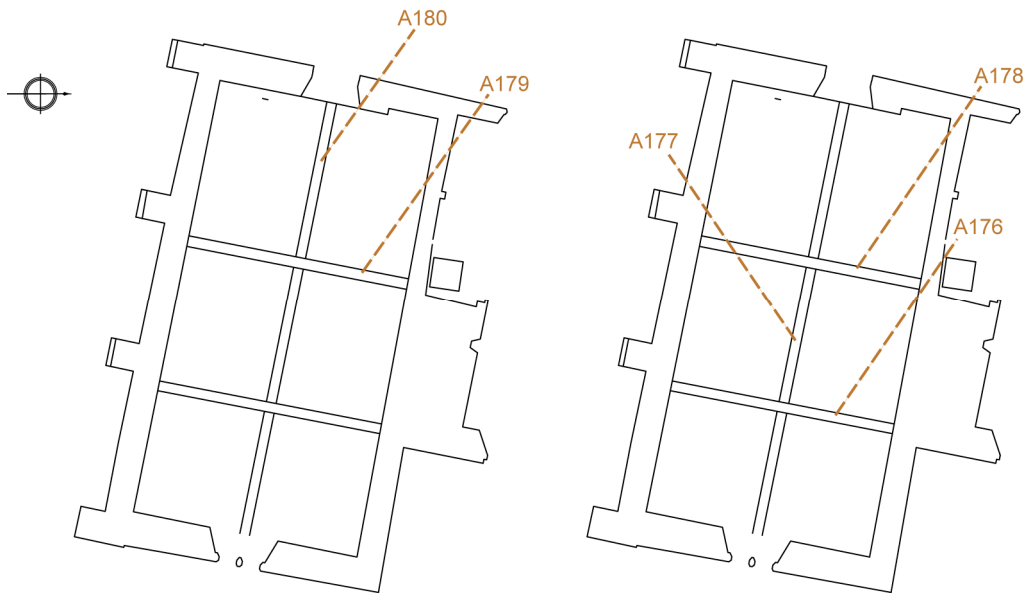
Granary, showing the locations of samples APT-A179–80 from the ground-floor ceiling and samples APT-A176–8 from the first-floor ceiling
